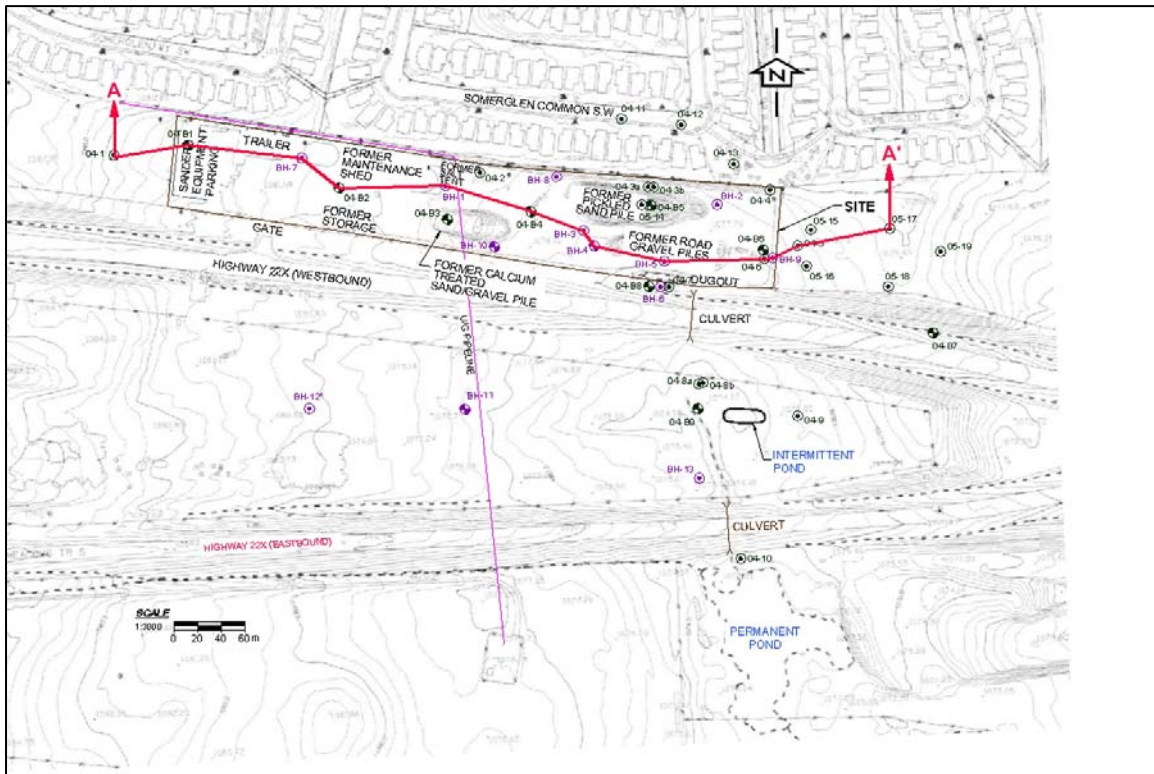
Site plan showing borehole and monitoring well locations as well as the geological cross section line.
